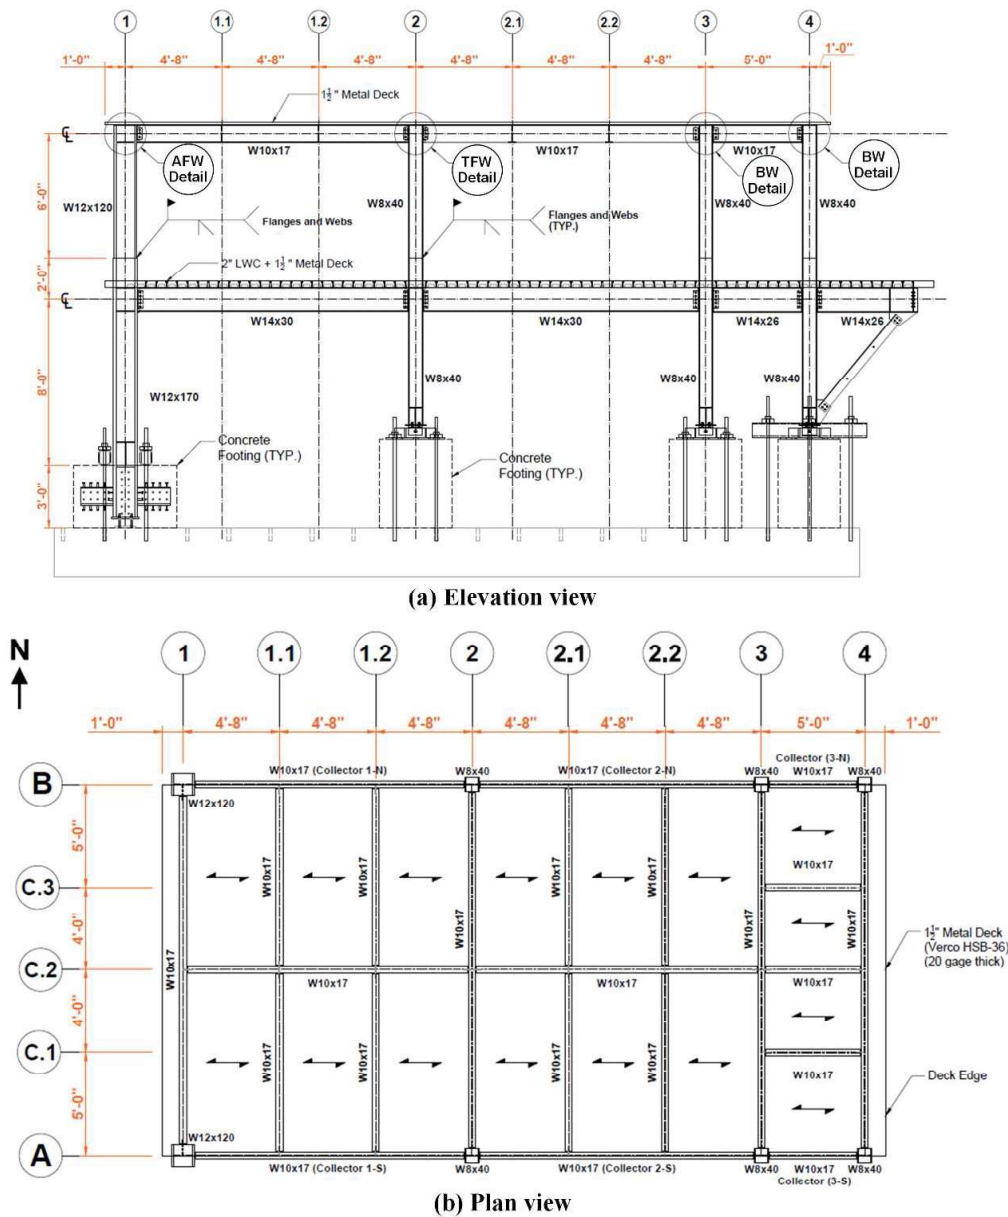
Phase 2 test frame: (a) elevation view; and (b) plan view
